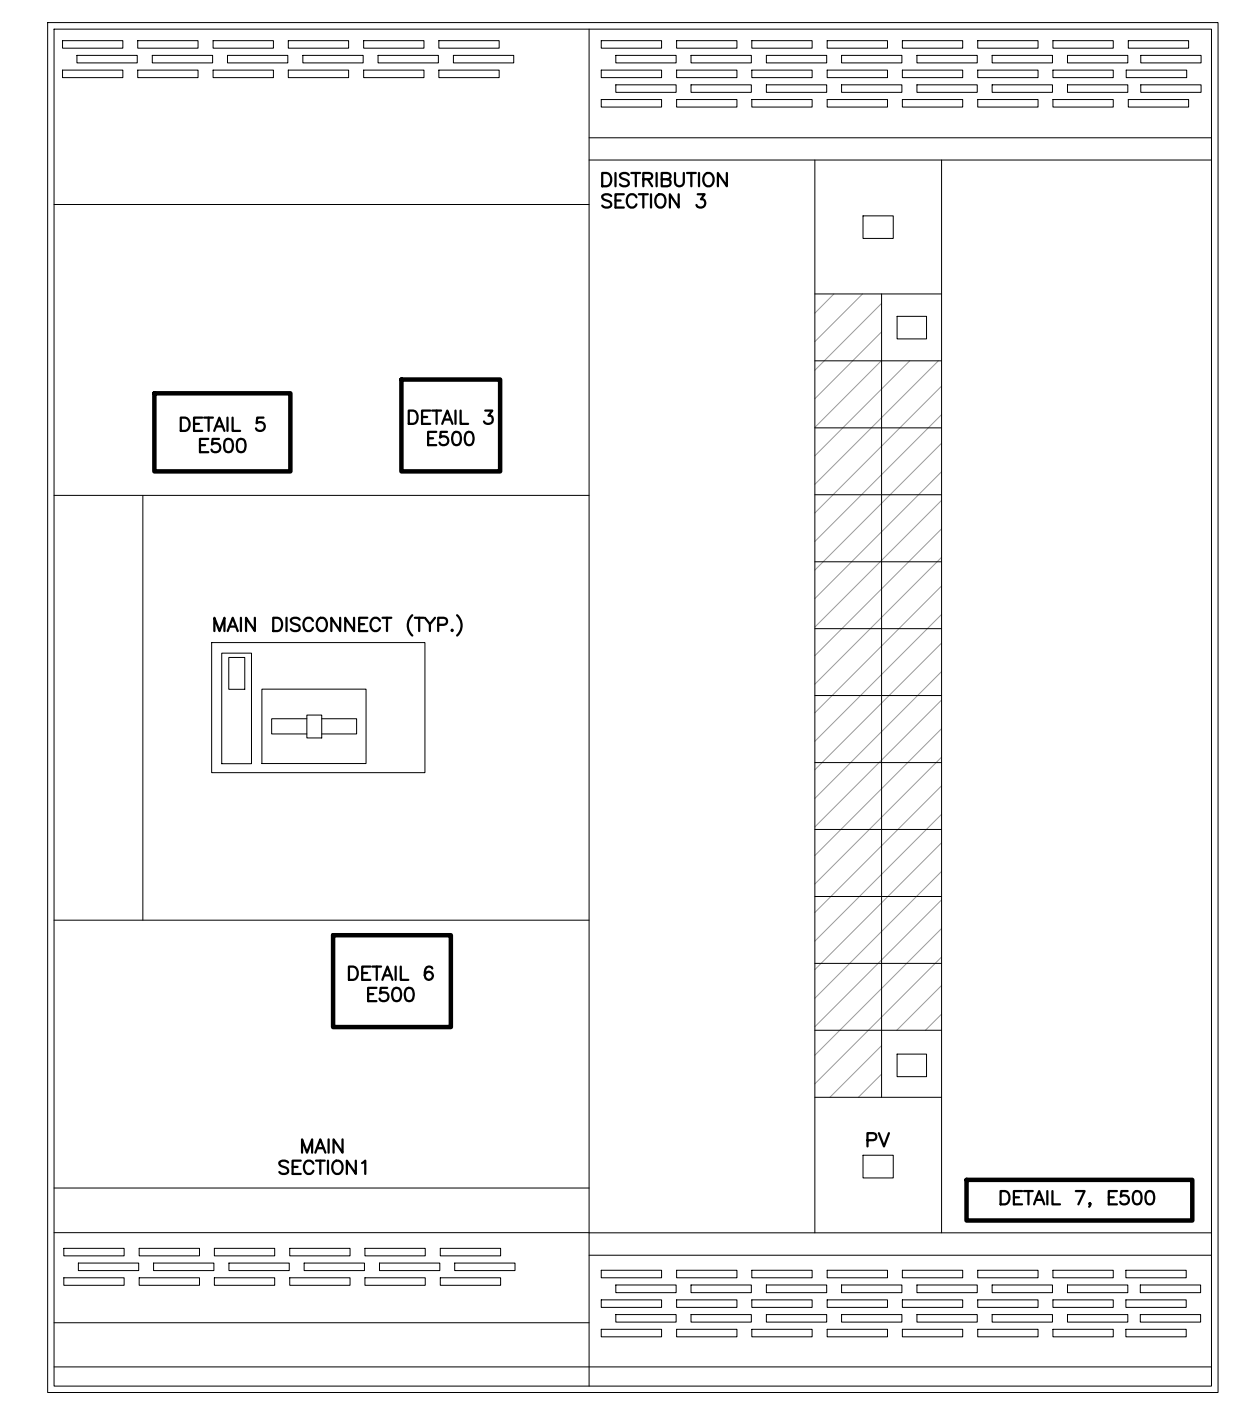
EXISTING BUILDING SWITCHGEAR (TYP.)
